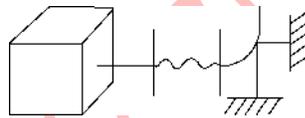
Improper Use of Spring Support on Piping Expansion Joint
